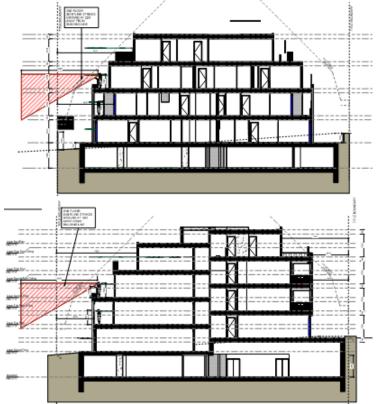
Sectional diagram demonstrating overlooking measures from second floor terrace, toward the west
